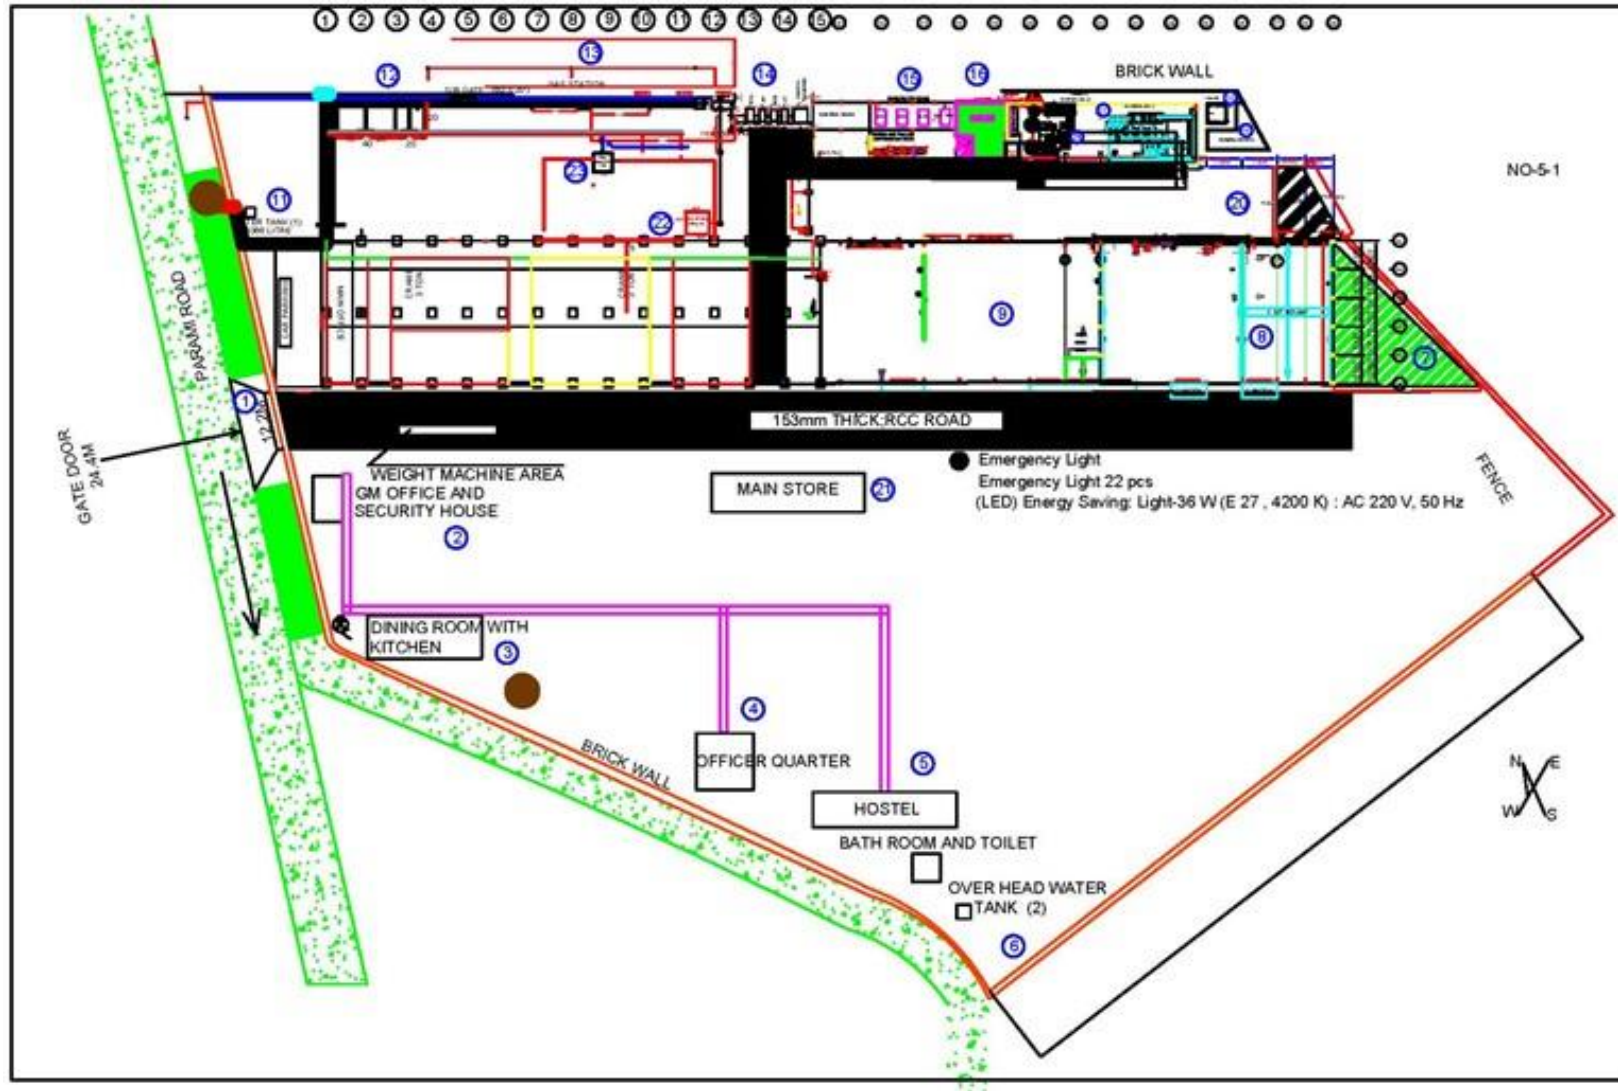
Factory Drainage Pipe Plan of Yangon Metal Industry Co., Ltd.
